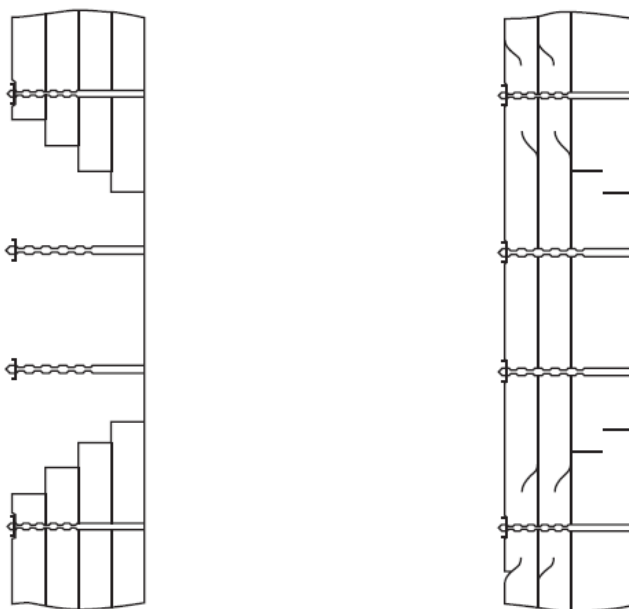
Typical Blanket Lining Repair of Multiple Layers
